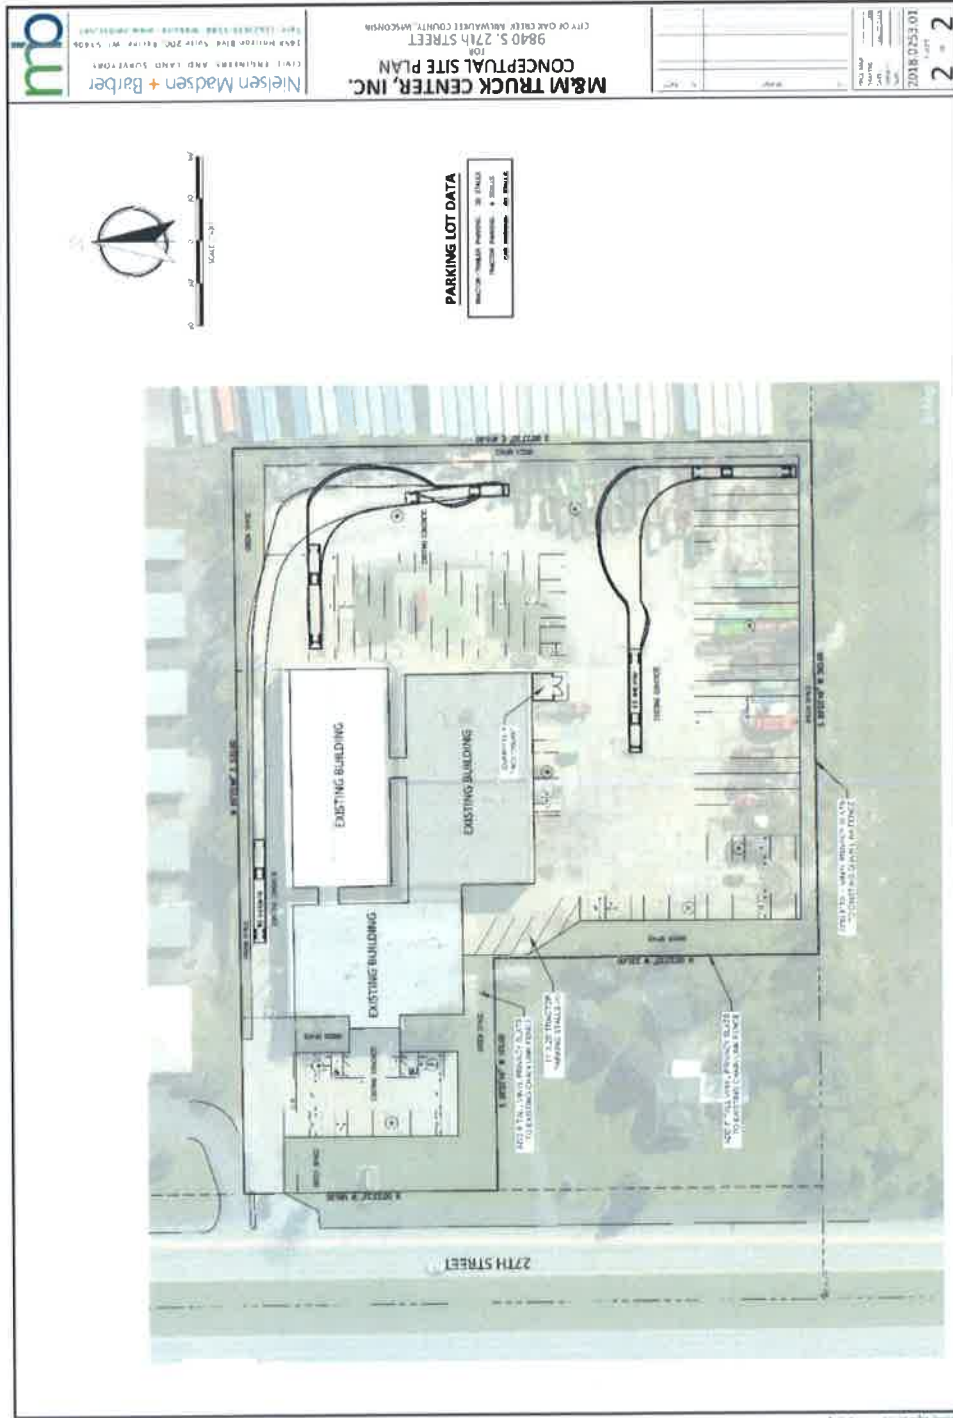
EXHIBIT A CONT'D: CONCEPTUAL SITE PLAN (ENLARGED)
